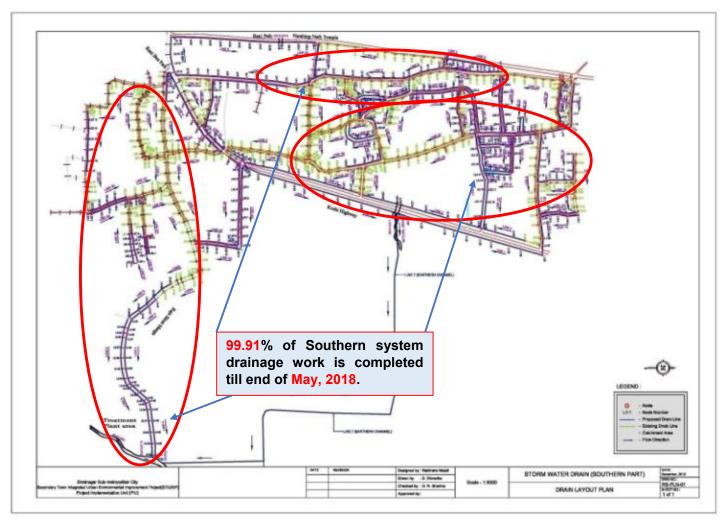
PROPOSED STORM WATER DRAINS IN BMC (Southern Drainage System)
